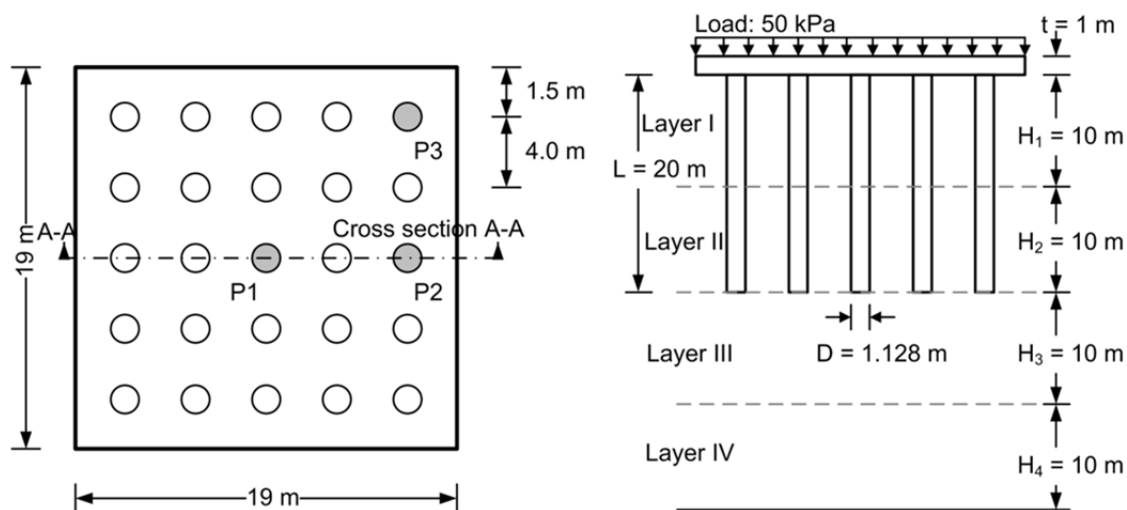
Layout of piled raft foundation studied by Chow & Small (2008)
